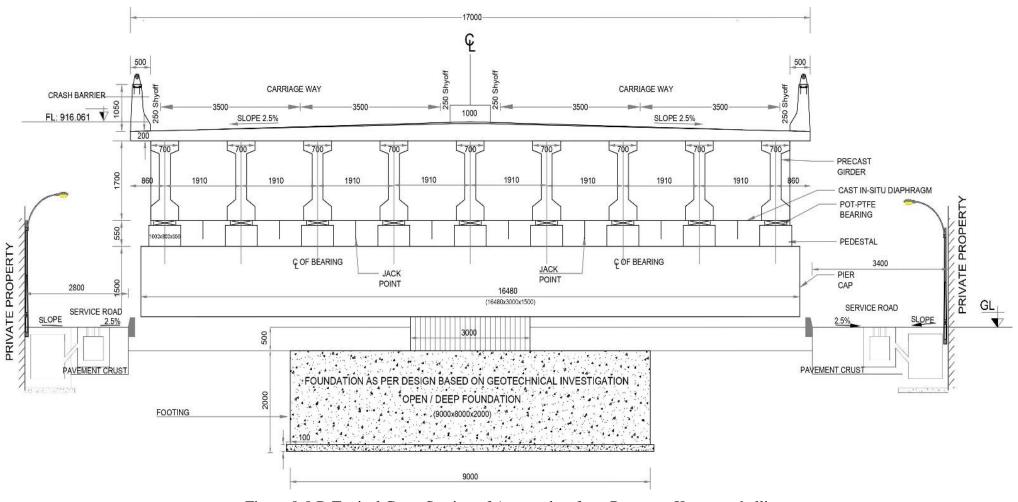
D Typical Cross Section of Approaches from Rotary to Kammanahalli
